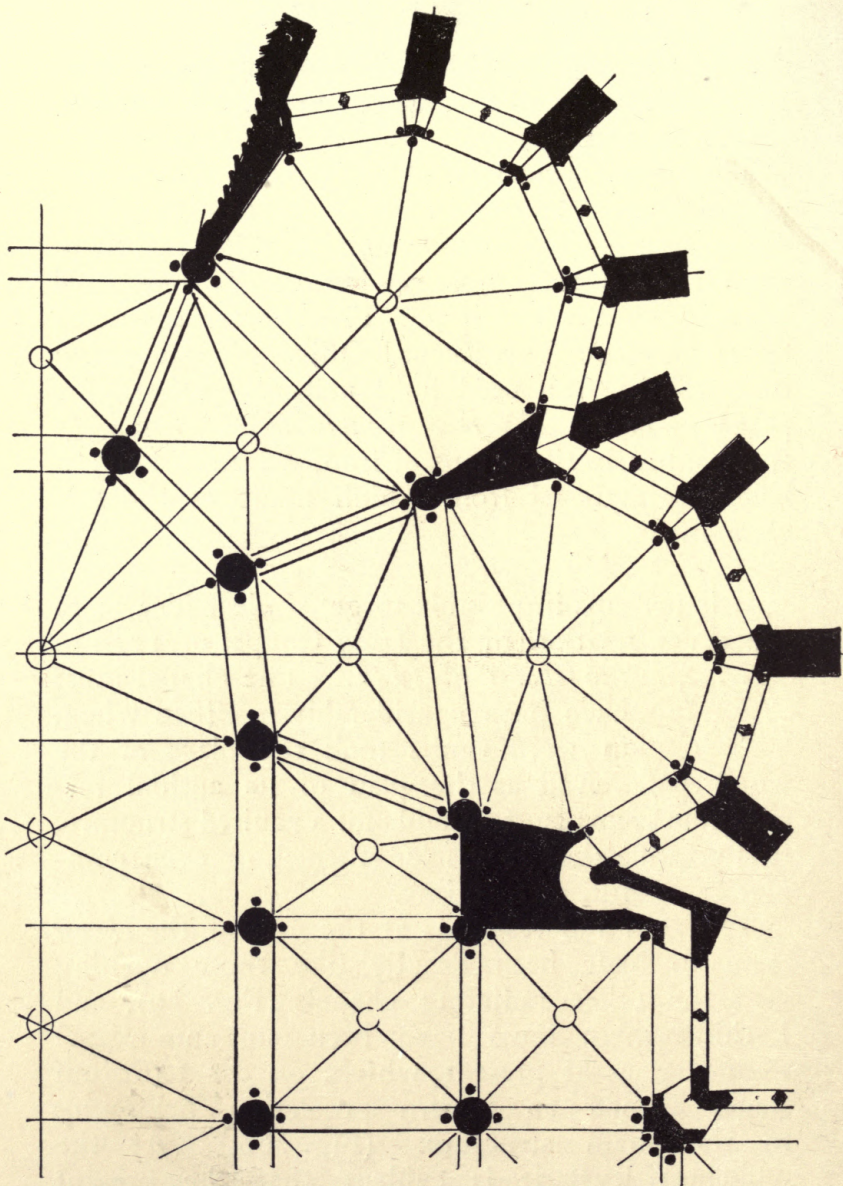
Sketch Plan of Apsidal Chapels, showing the passage along windows
